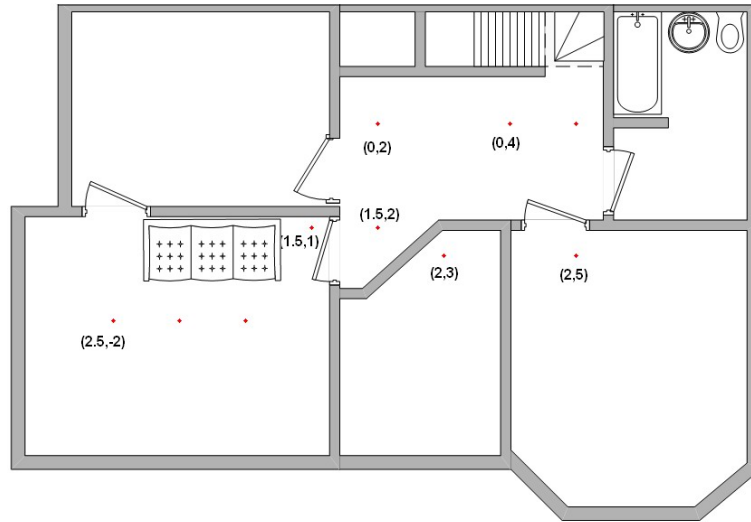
Measurement layout on second floor of 17 Schussler Road
